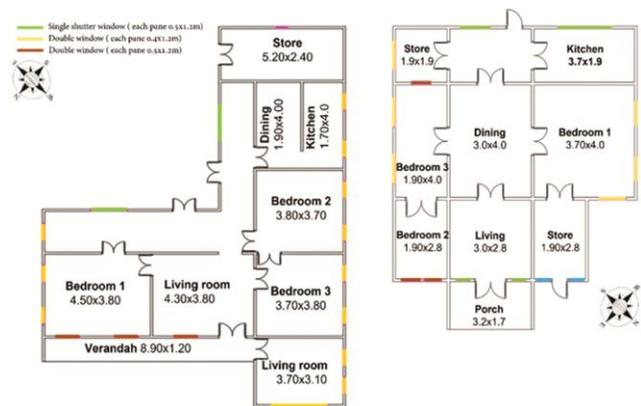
Example of spatial layouts in Assam-type houses (Dimensions in meter)
